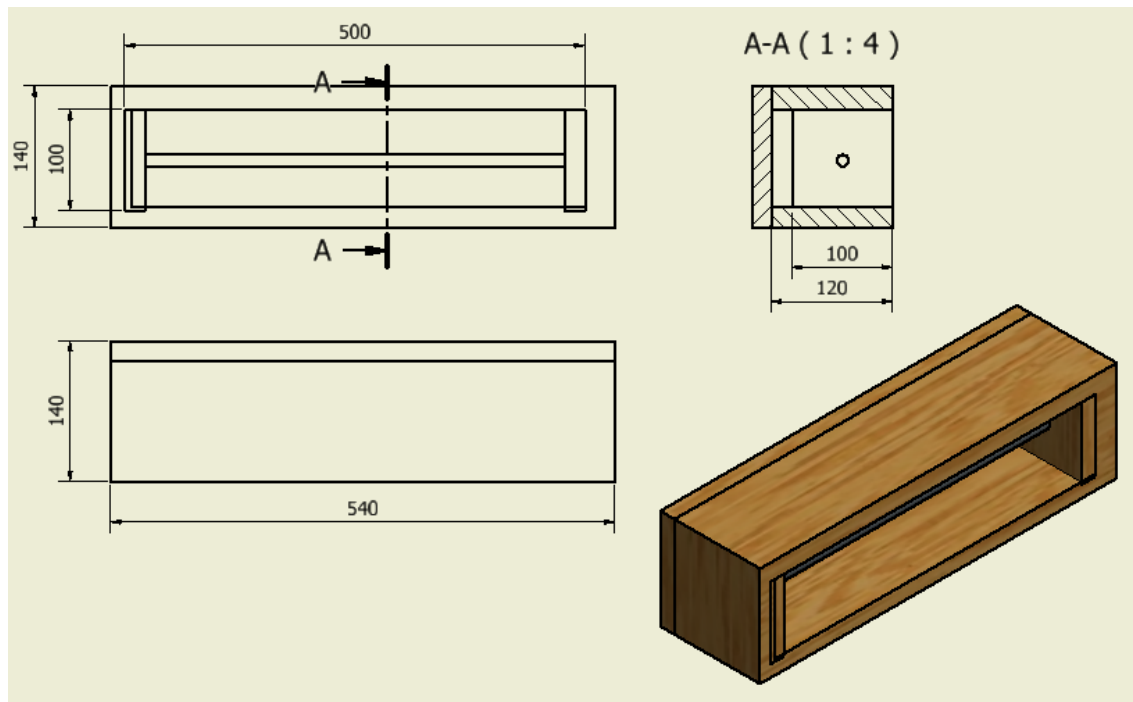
Schematics of the beam mould with the reinforcement steel
